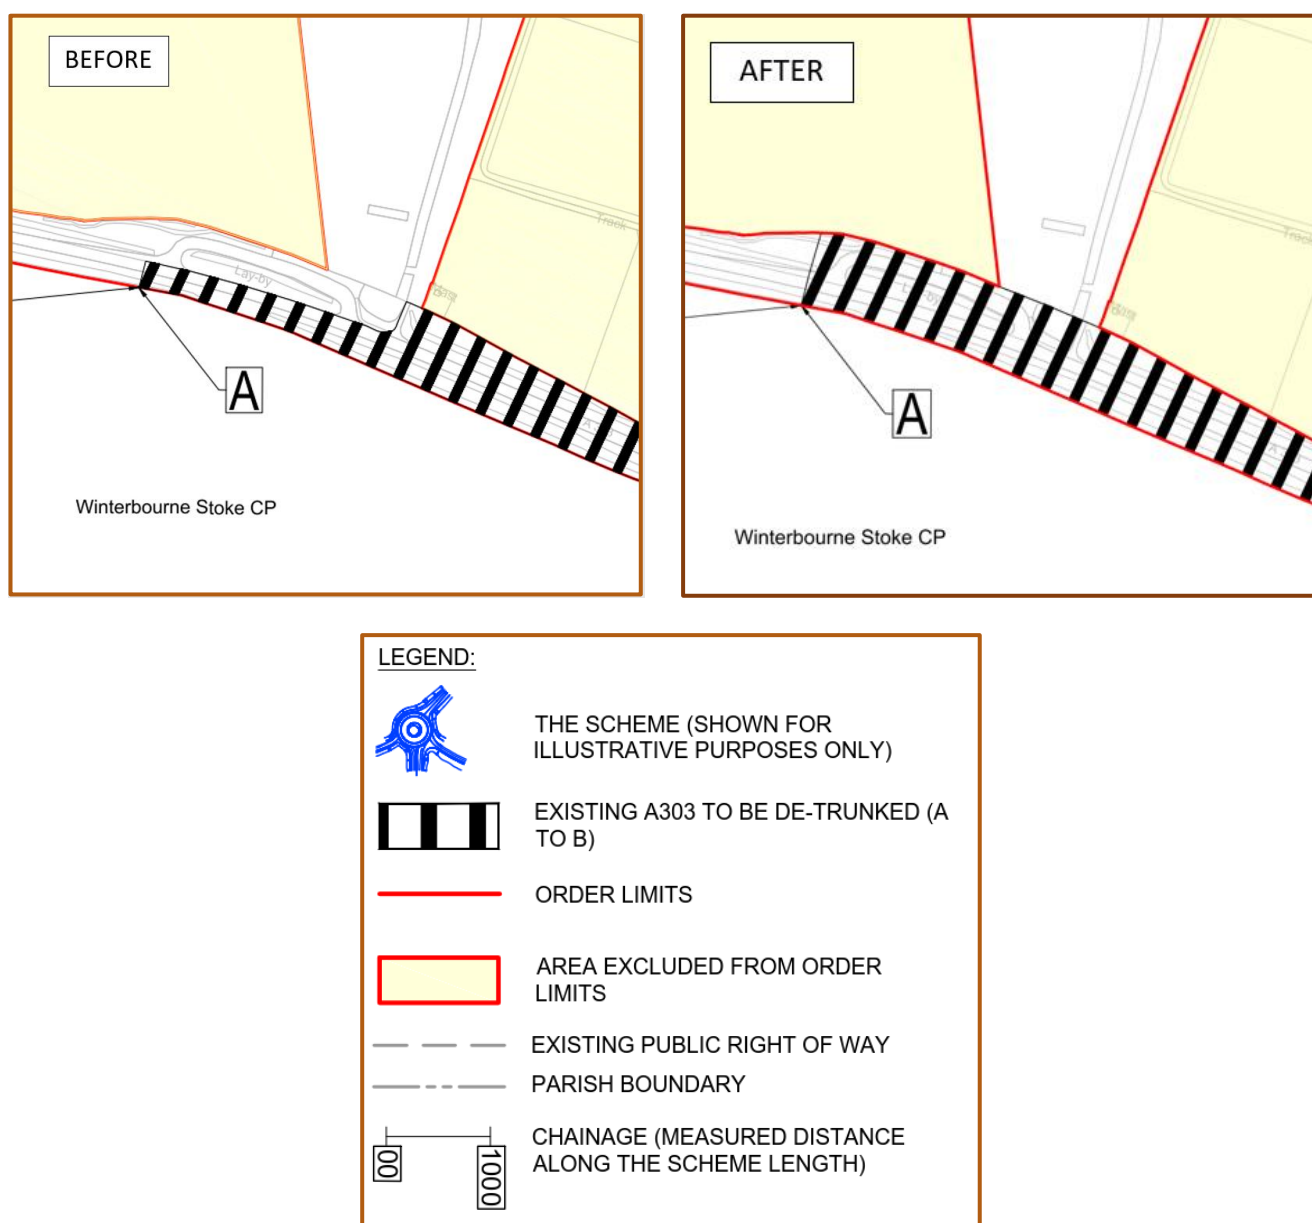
Extract from De-Trunking Plans [APP-015]
